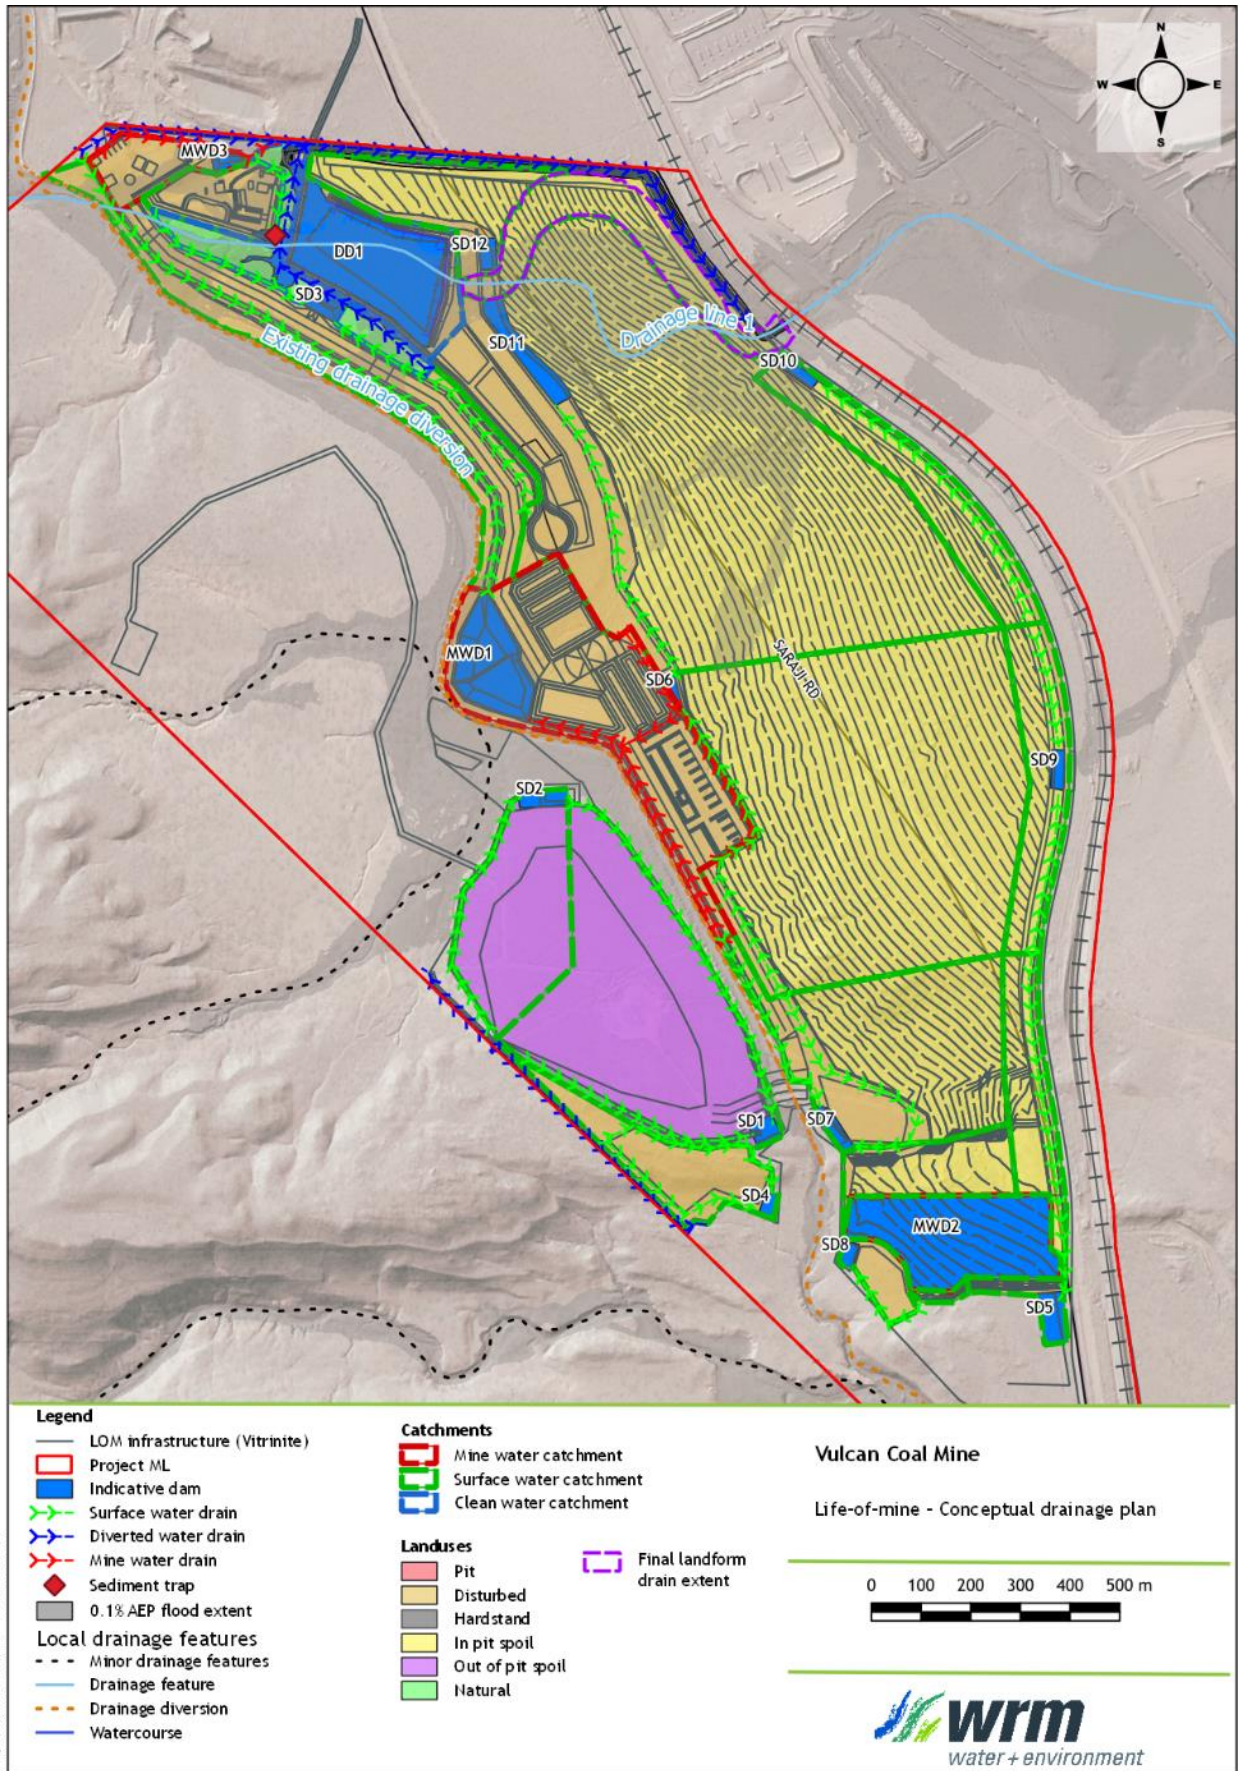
LOM (post-mining conditions) conceptual drainage plan
